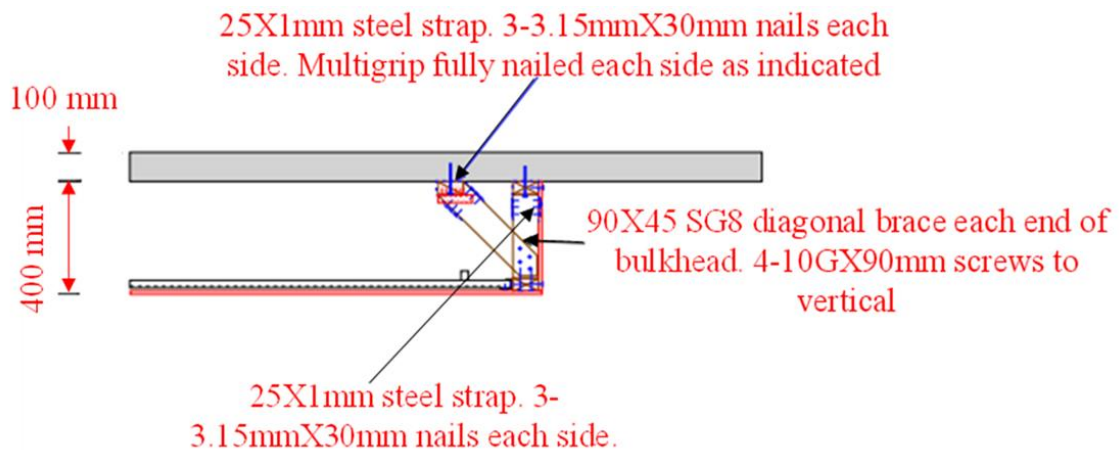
Side view of the timber-framed bulkhead (similar to Phase II but without plasterboard lining)
